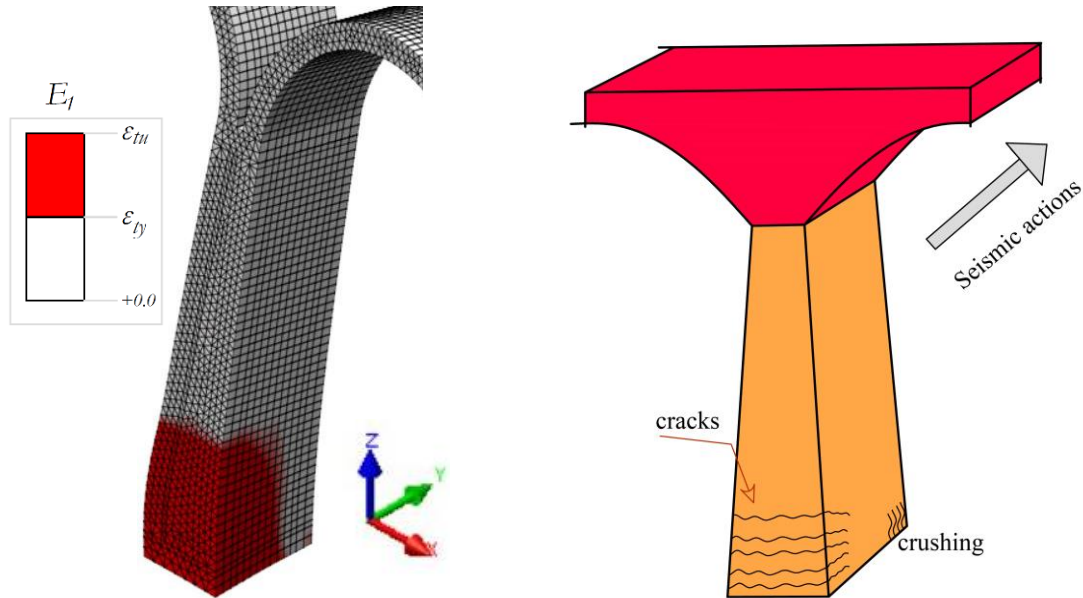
a) Model with  $D^*/D=1$ , pushover analysis in Y, crack contour in the longitudinal section of the bridge. b) collapse mechanism of the pier
